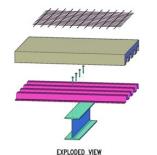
Conventional composite framing materials including steel mesh, steel headed stud anchors, concrete, and steel deck are not reusable; steel headed stud anchors must be removed
